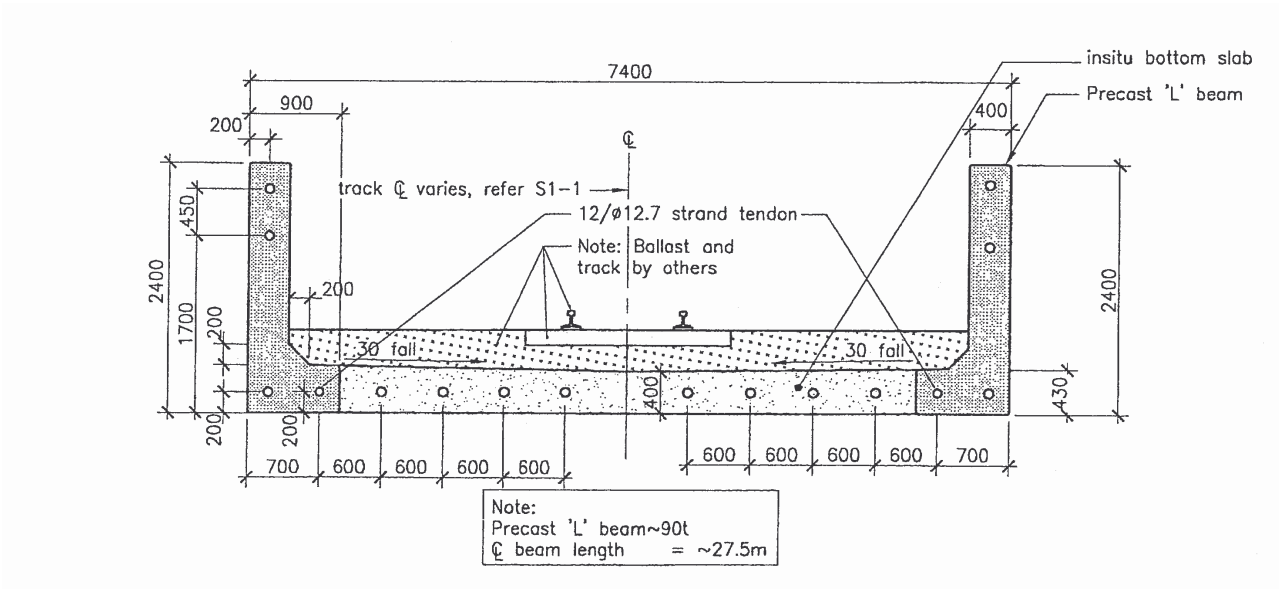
Superstructure girders showing typical precast L beams and insitu bottom slab stitch
